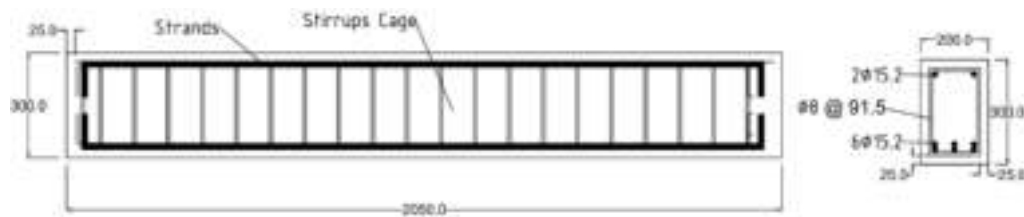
Sample beam detailing containing stirrups (S-8-91.5-2.5-35).
